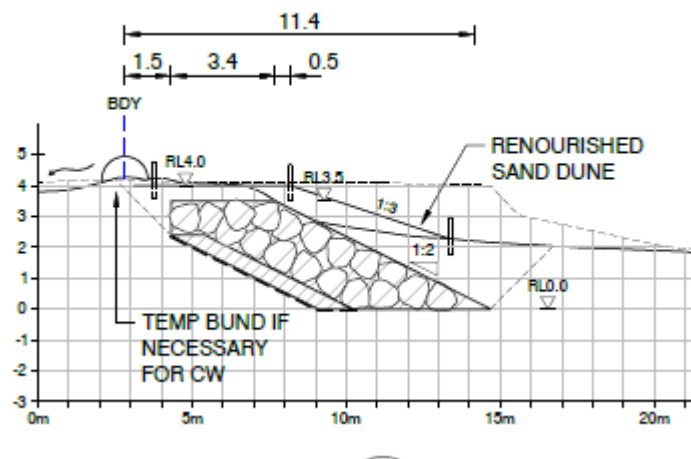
Amended Cross-section Southern Wall 1.5m from Boundary
